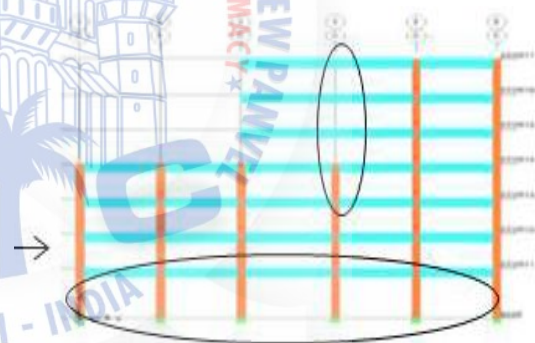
Elevation of Combination Of Irregular Building [12]
